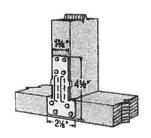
RSP4 INSTALLATION: STUD TO SILL PLATE U.S. PATENT 5,697,725
